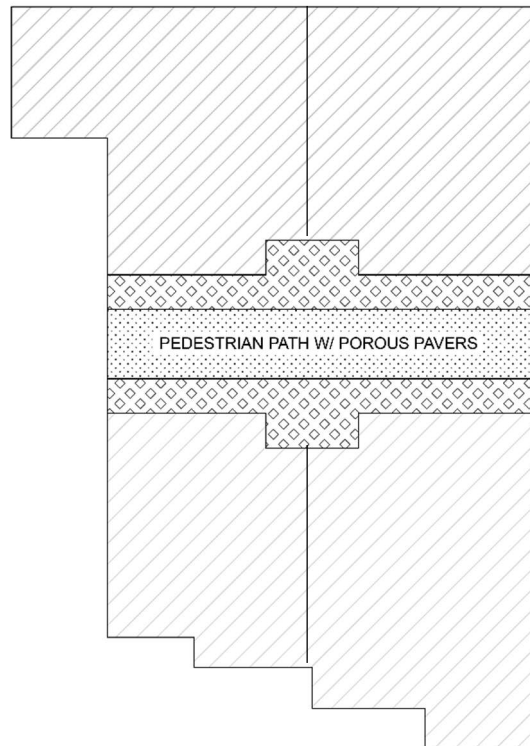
Diagram representing potential use of porous pavers to help facilitate stormwater management and runoff (SHOWN ABOVE)
